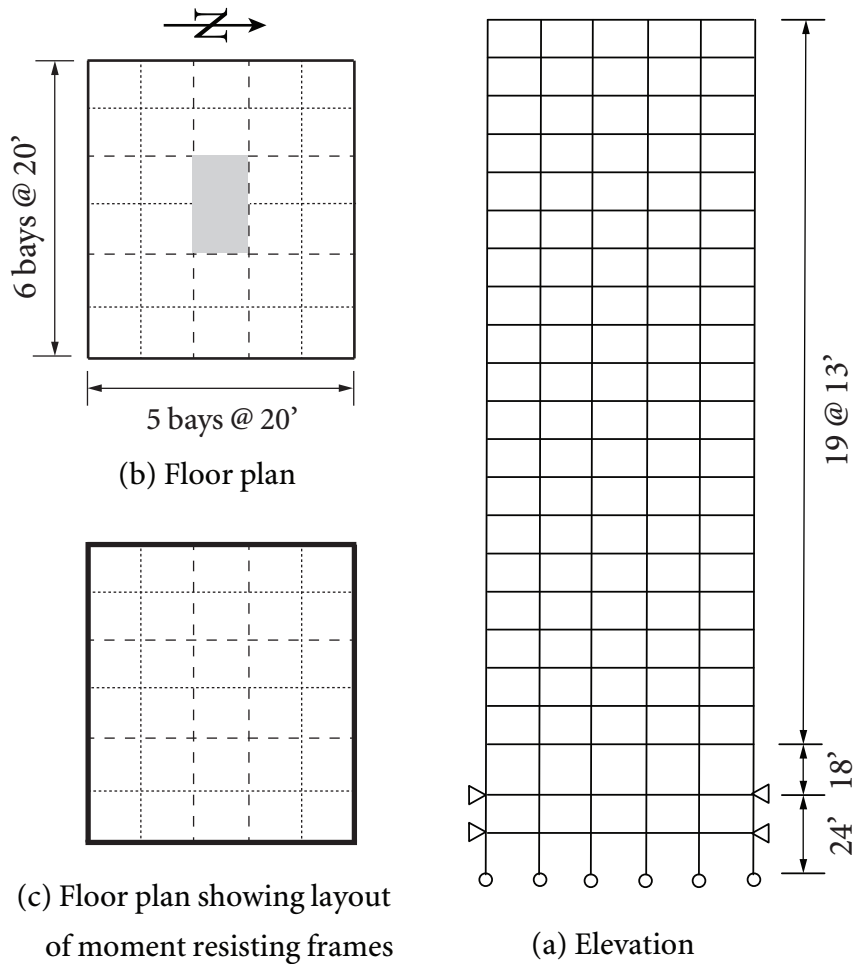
Floor plans and elevations of 20-storey SMRF model
